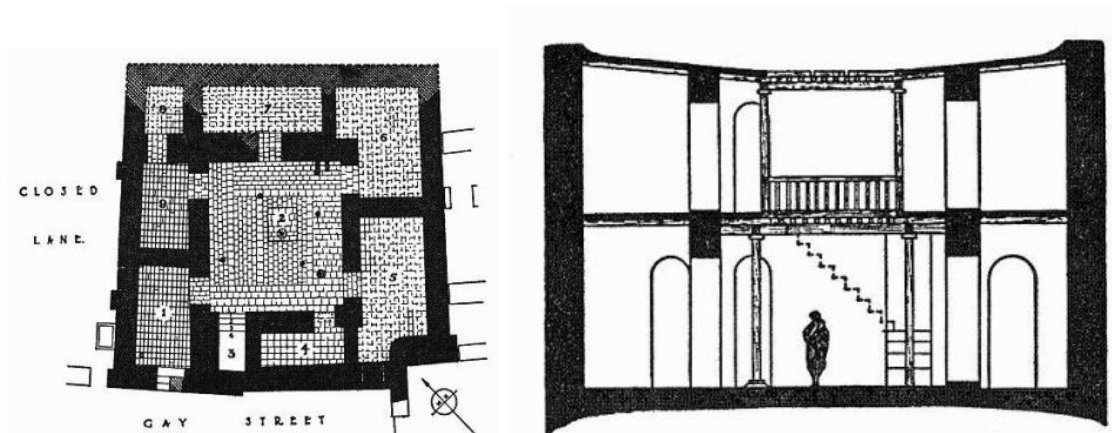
Plan and section of house of Ur, Mesopotamia (Bednar, 1986)
